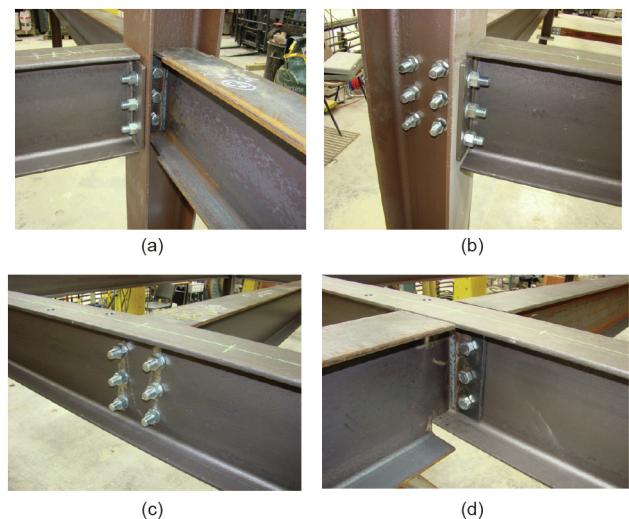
Details of beam-to-beam and beam-to-column joints. (a) Central column connections; (b) corner column connections; (c) primary edge beam connections; (d) primary central beam connections.
